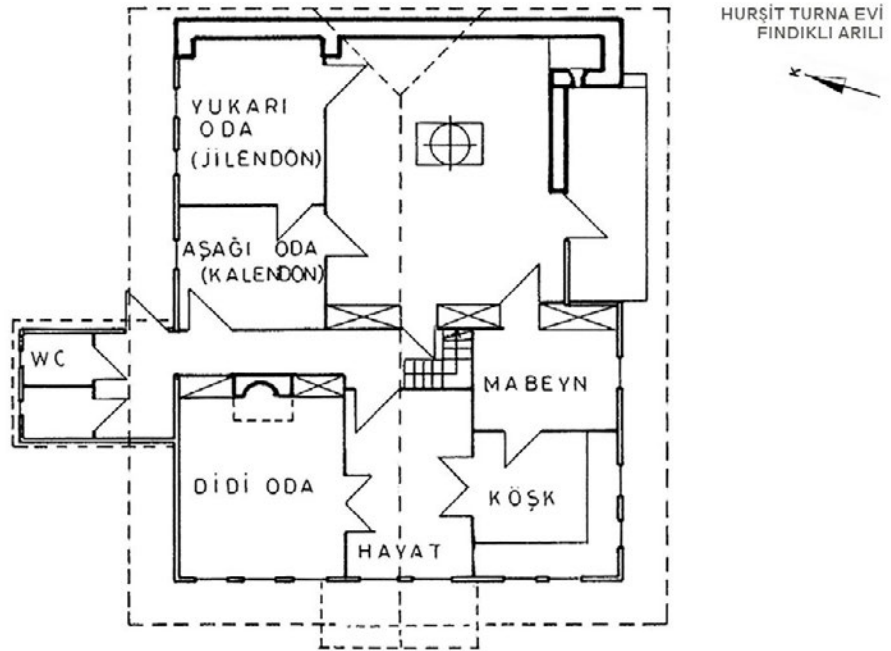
Layout plan of a typical vernacular house in Arılı village. Source: Drawing by Mustafa Sümerkan.
